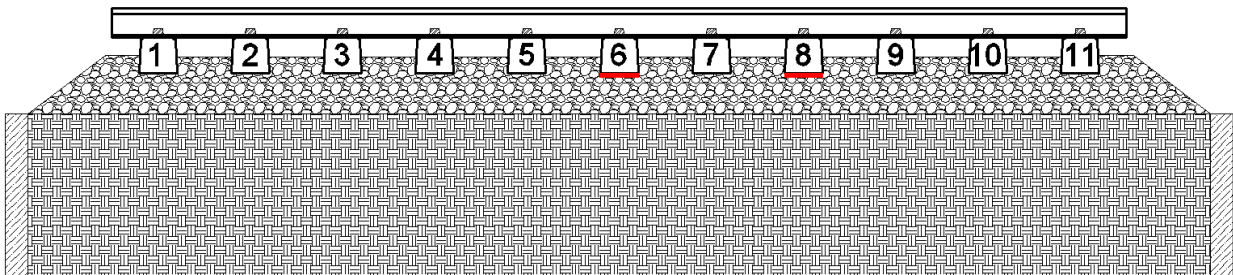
Gap Between Concrete and Ballast at Rail Seats 6 and 8 After the Clip Installation
